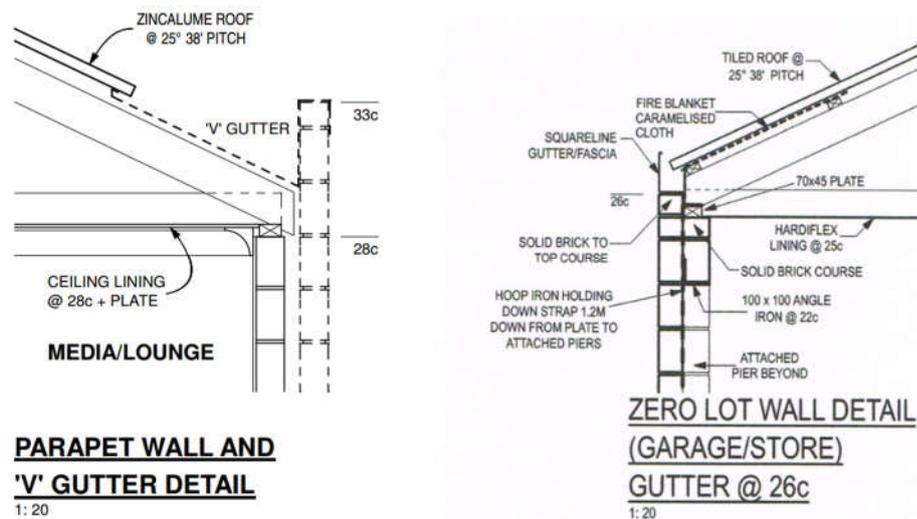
Two typical boundary wall details for double brick construction (source: author)
